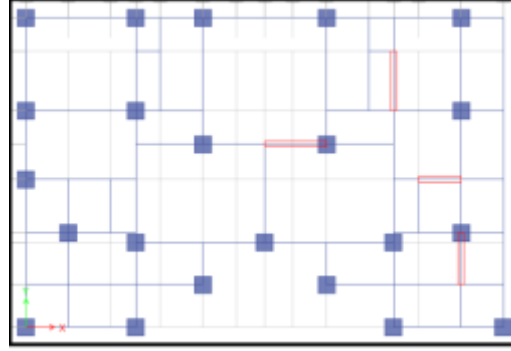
Plan showing structure with Four concentric shear wall
